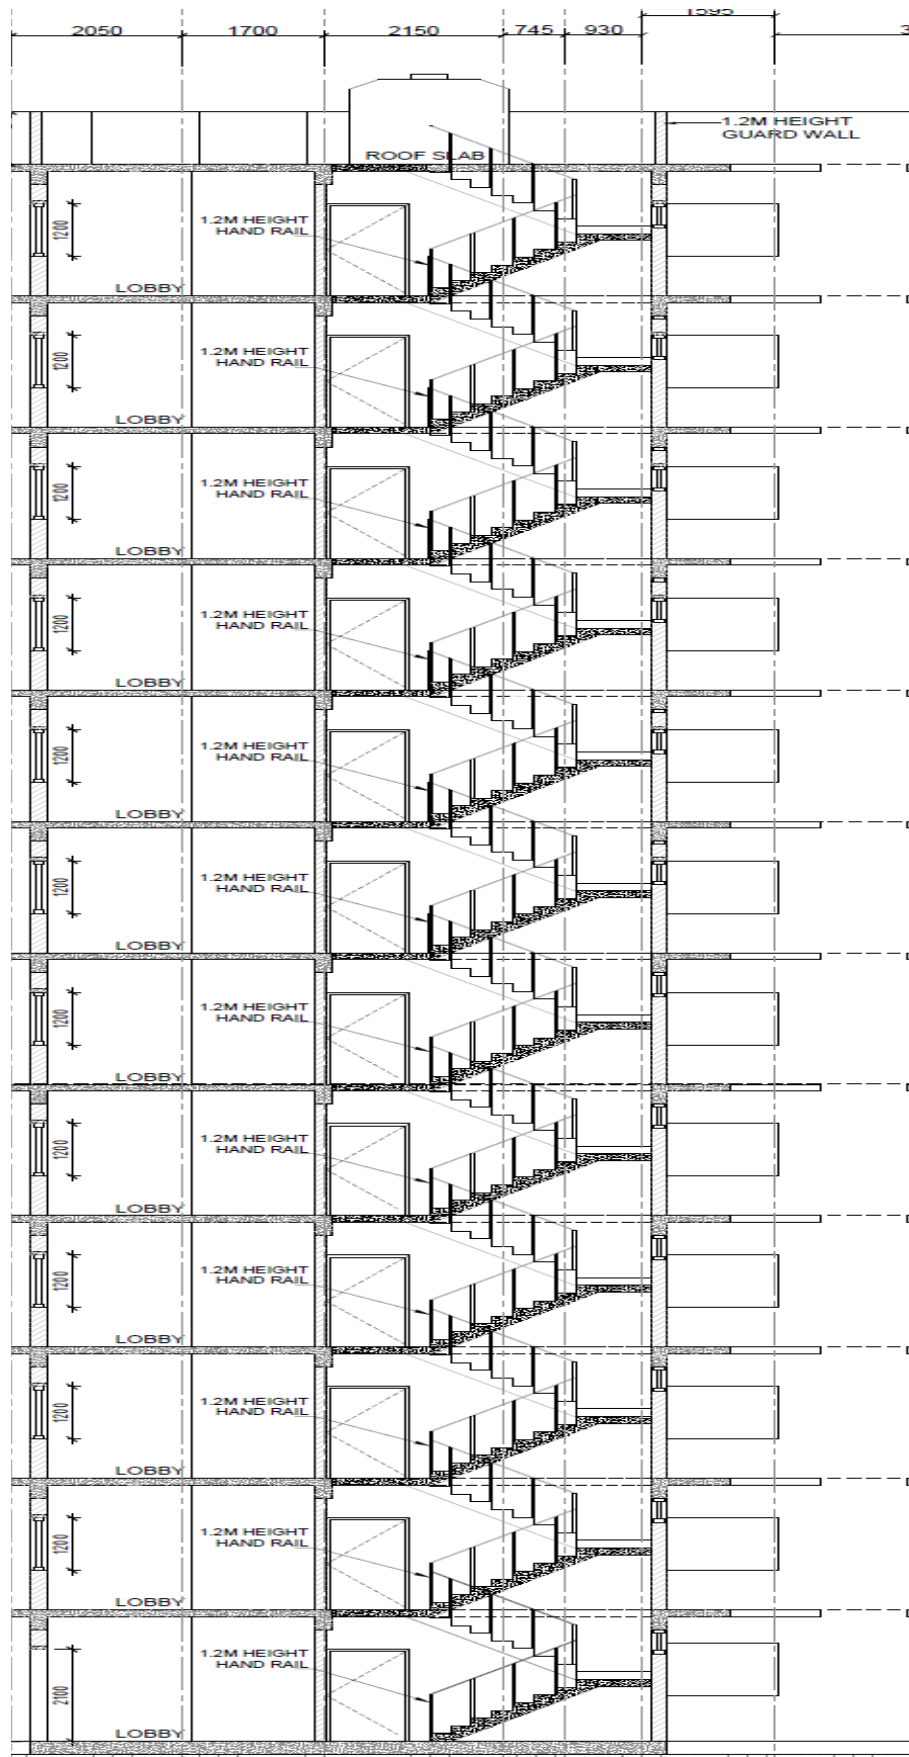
53: Emergency exit – outside staircase. For three main buildings
